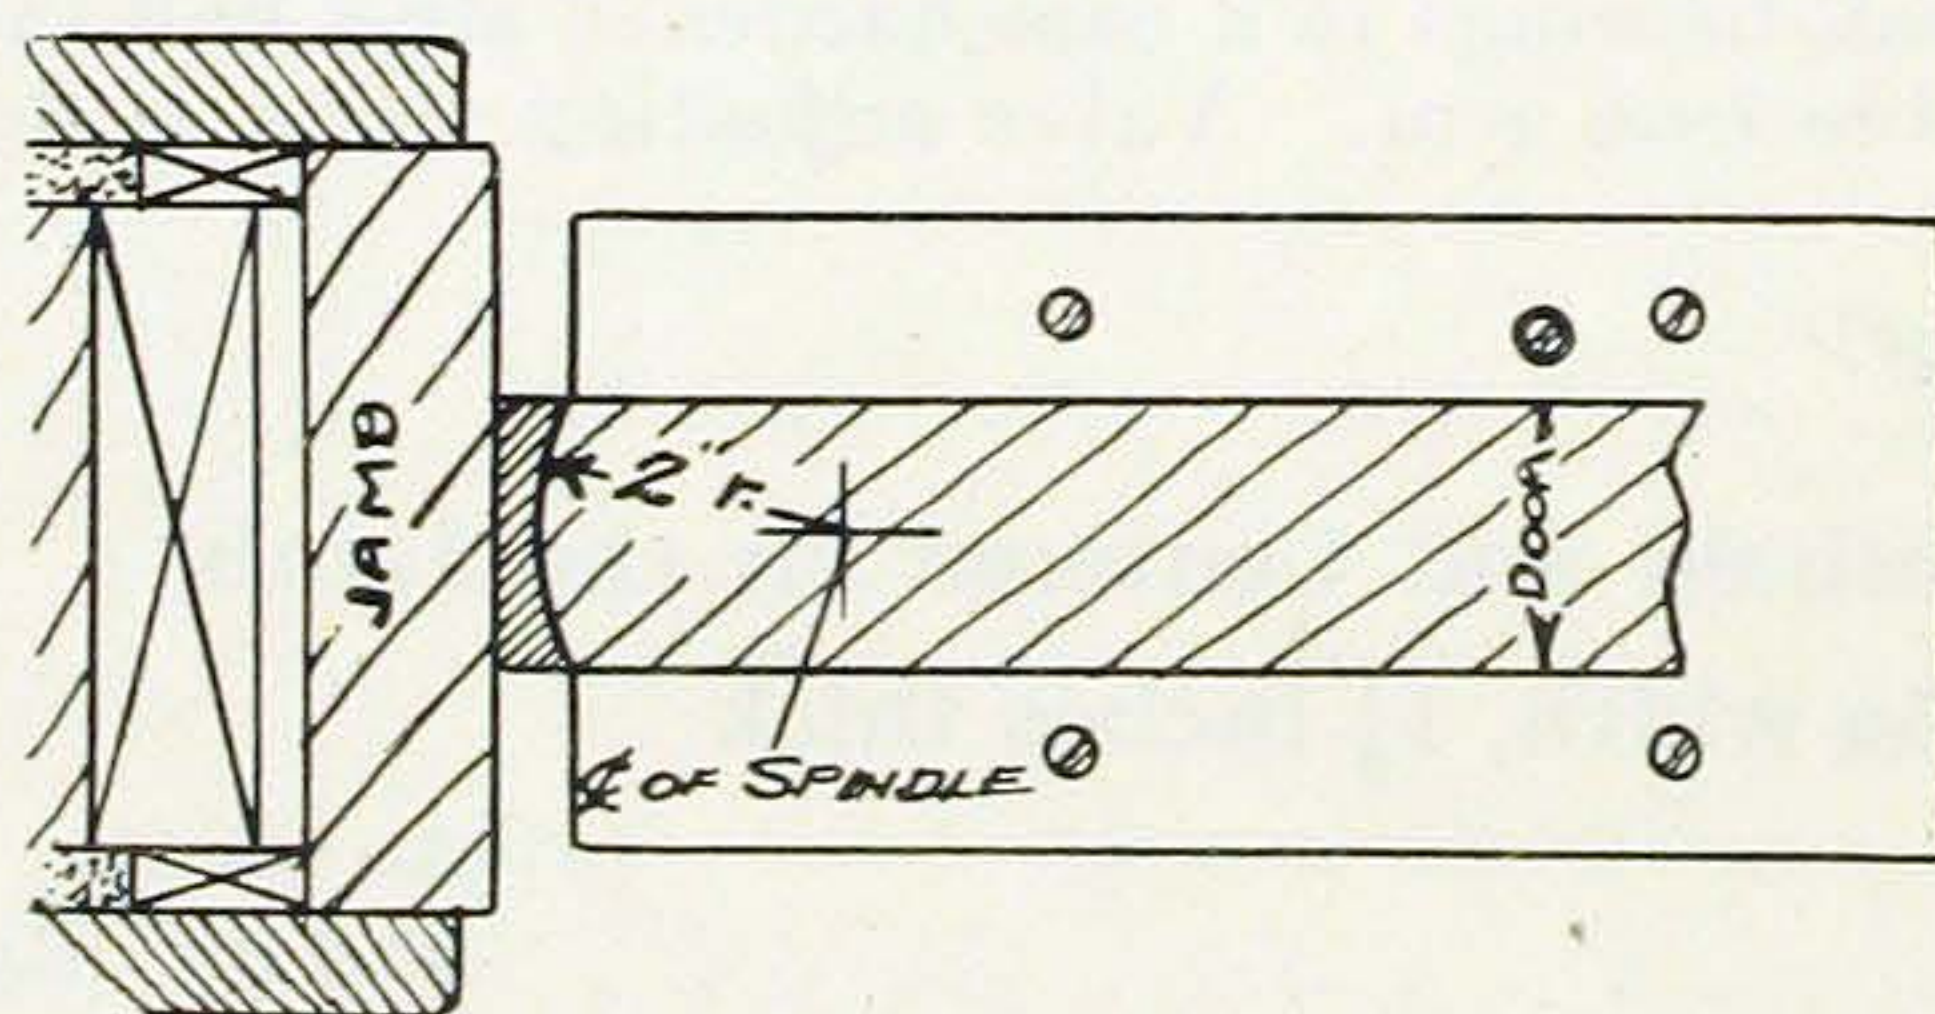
DETAILS FOR APPLICATION OF RUSSWIN CHECKING FLOOR HINGES
